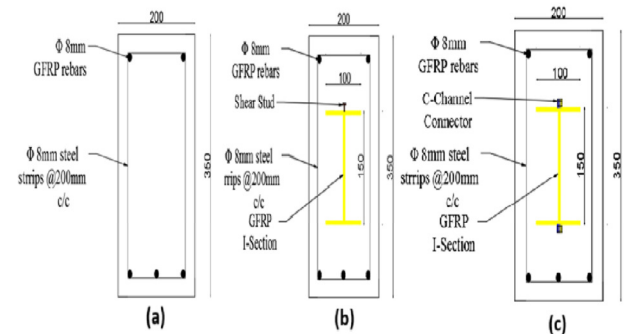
Details of tested specimens: (a) B- specimen, (b) BSTB – specimen, (c) BCEB- specimen.
